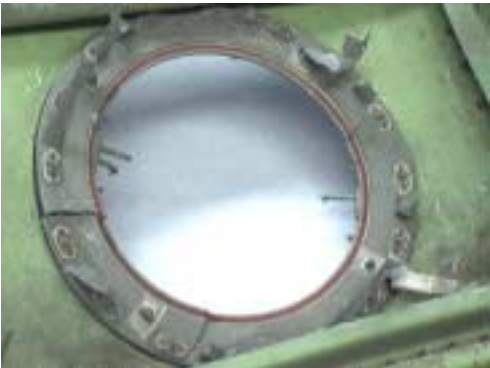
Interior view of opening with valve removed (looking inside to outside).
